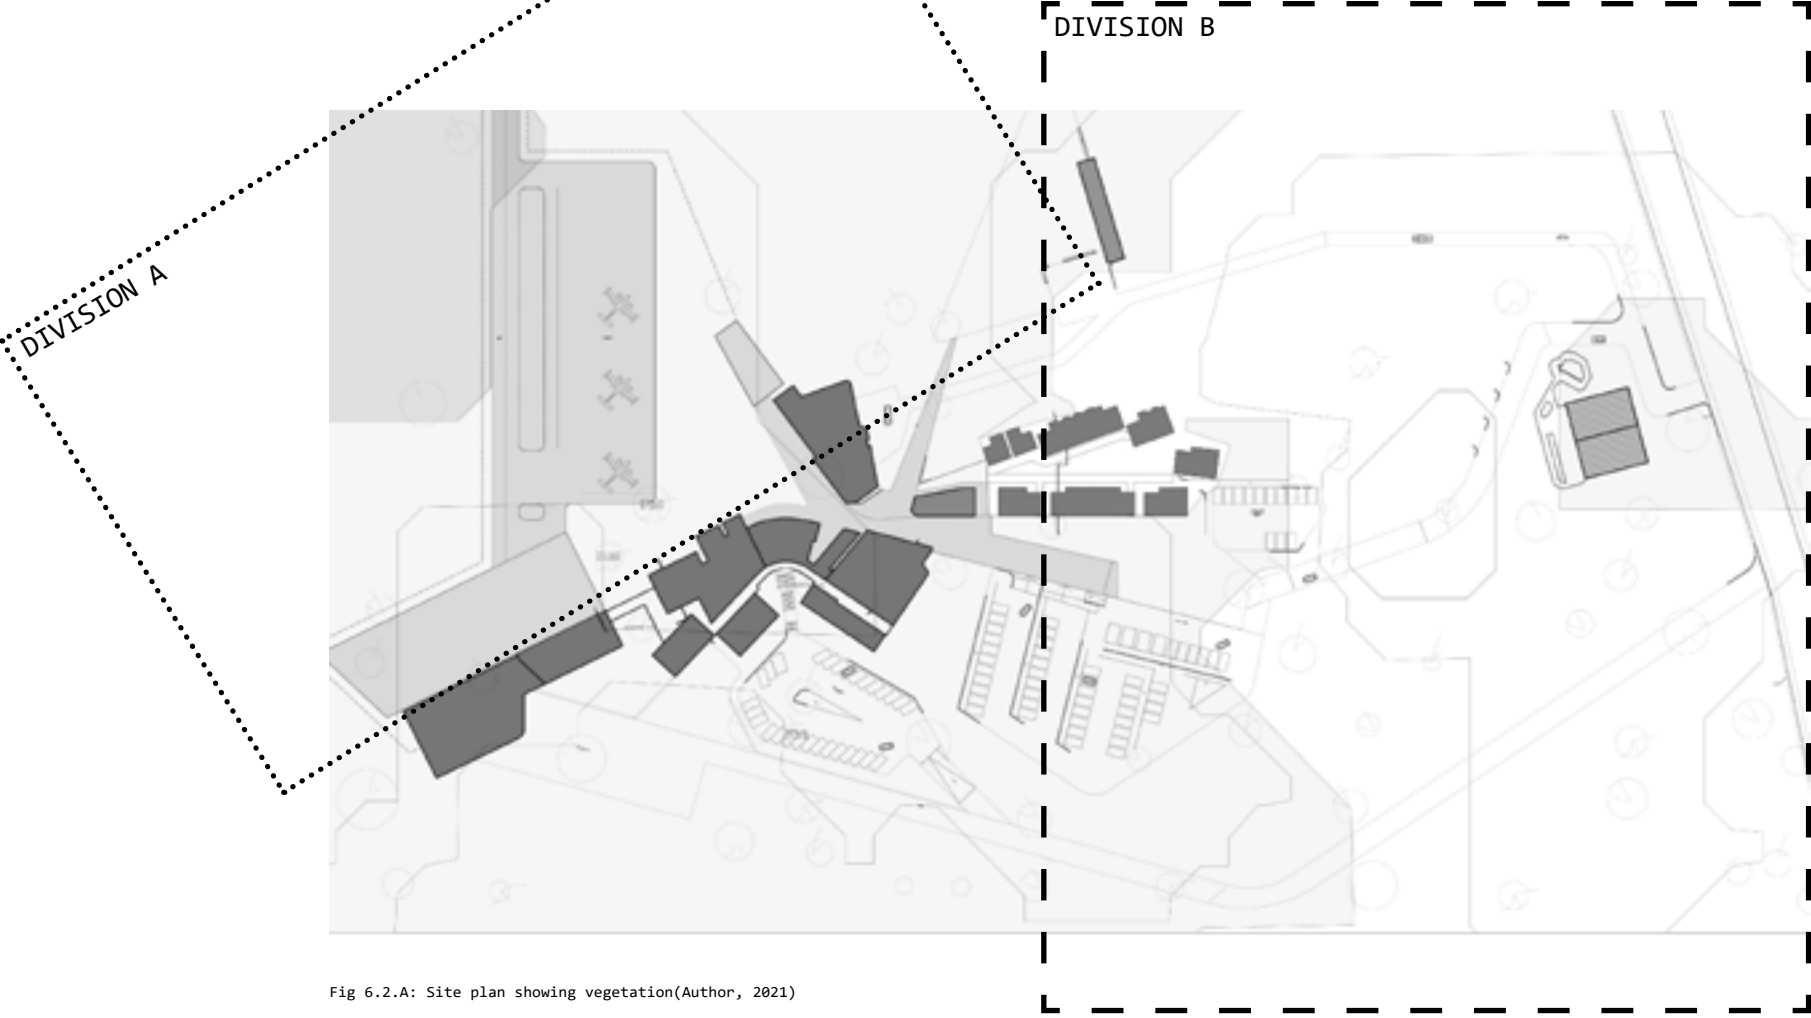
A: Site plan showing vegetation(Author, 2021)
